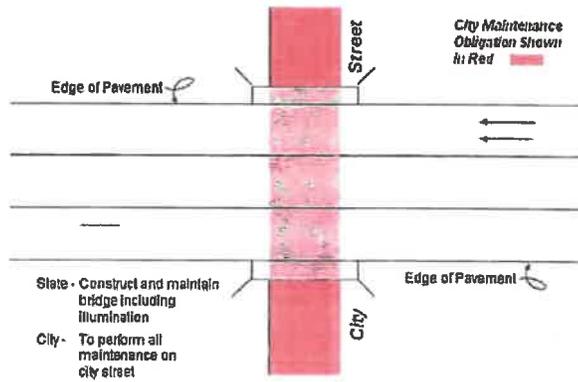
EXISTING CITY STREET CROSSED BY NEW STATE HIGHWAY OVERPASS
